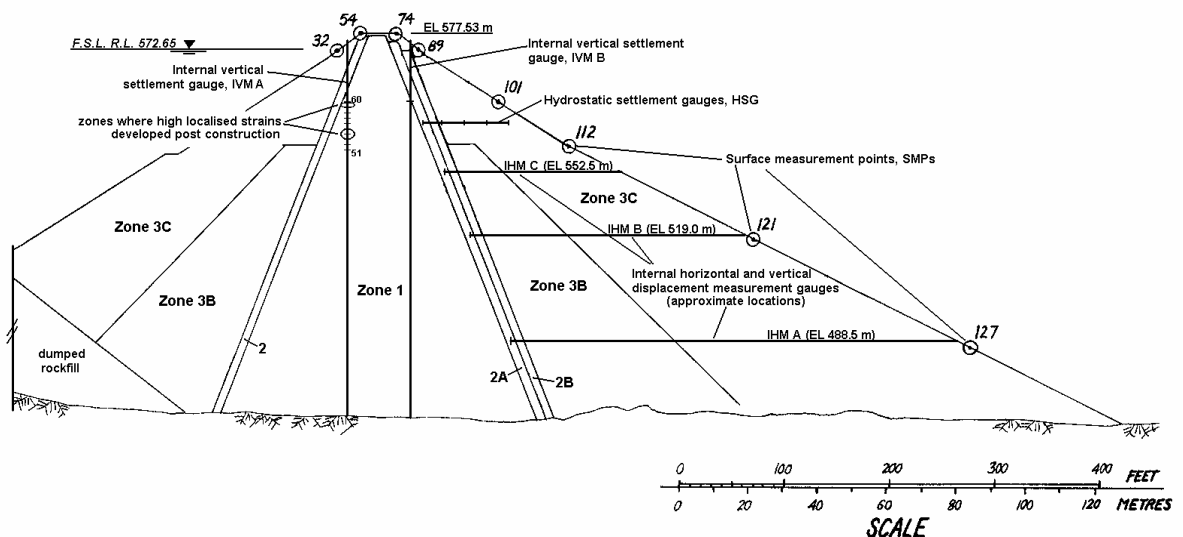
Main section at Copeton dam (courtesy of New South Wales Department of Land and Water Conservation)
